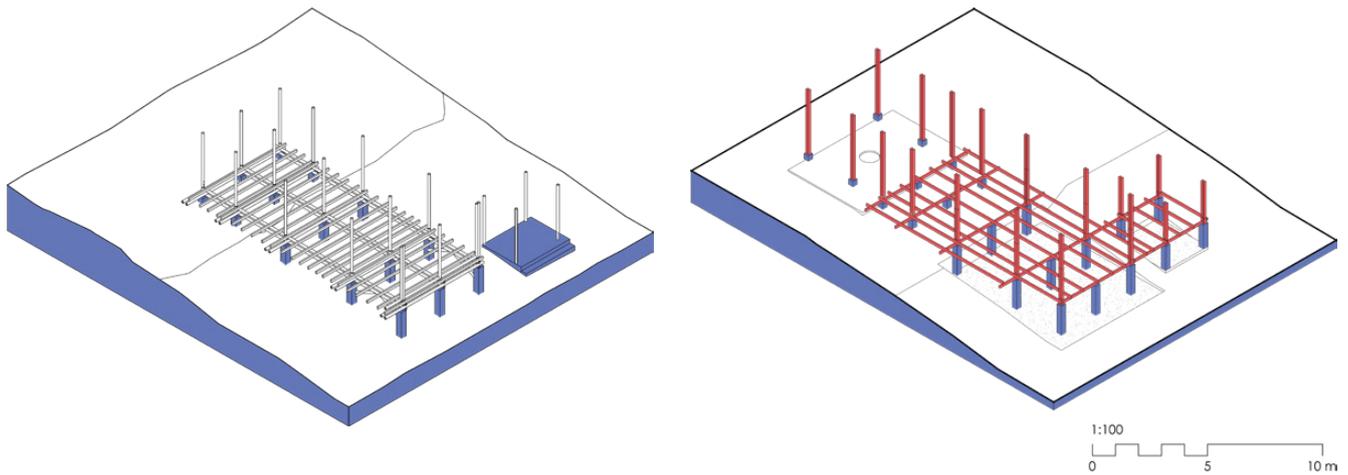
B. Intervention made on the construction plan between the existing and the proposal.
